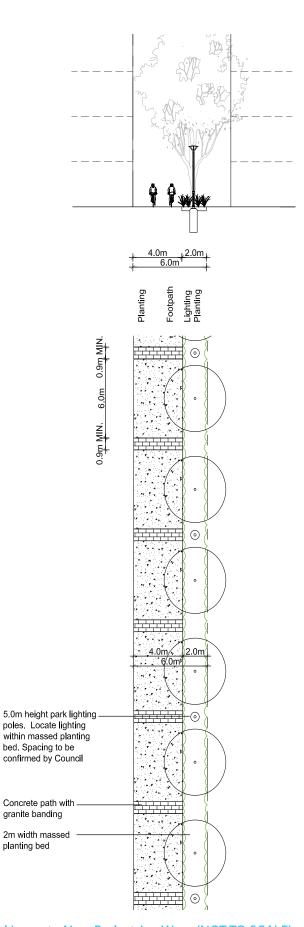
Typical Layout - New Pedestrian Ways (NOT TO SCALE)
